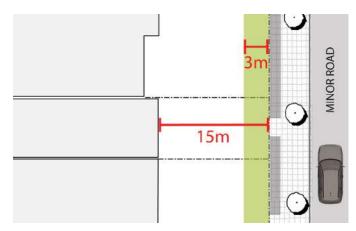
On minor roads there should be a 15m front building setback from the property boundary with a 3m (minimum) landscaped strip.
